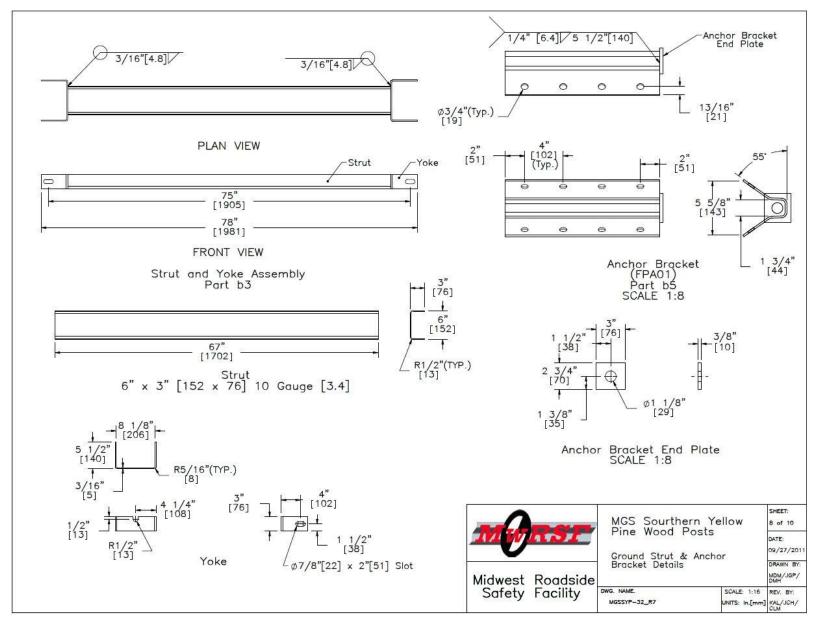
Ground Strut and Anchor Bracket Details, Test No. MGSSYP-2
